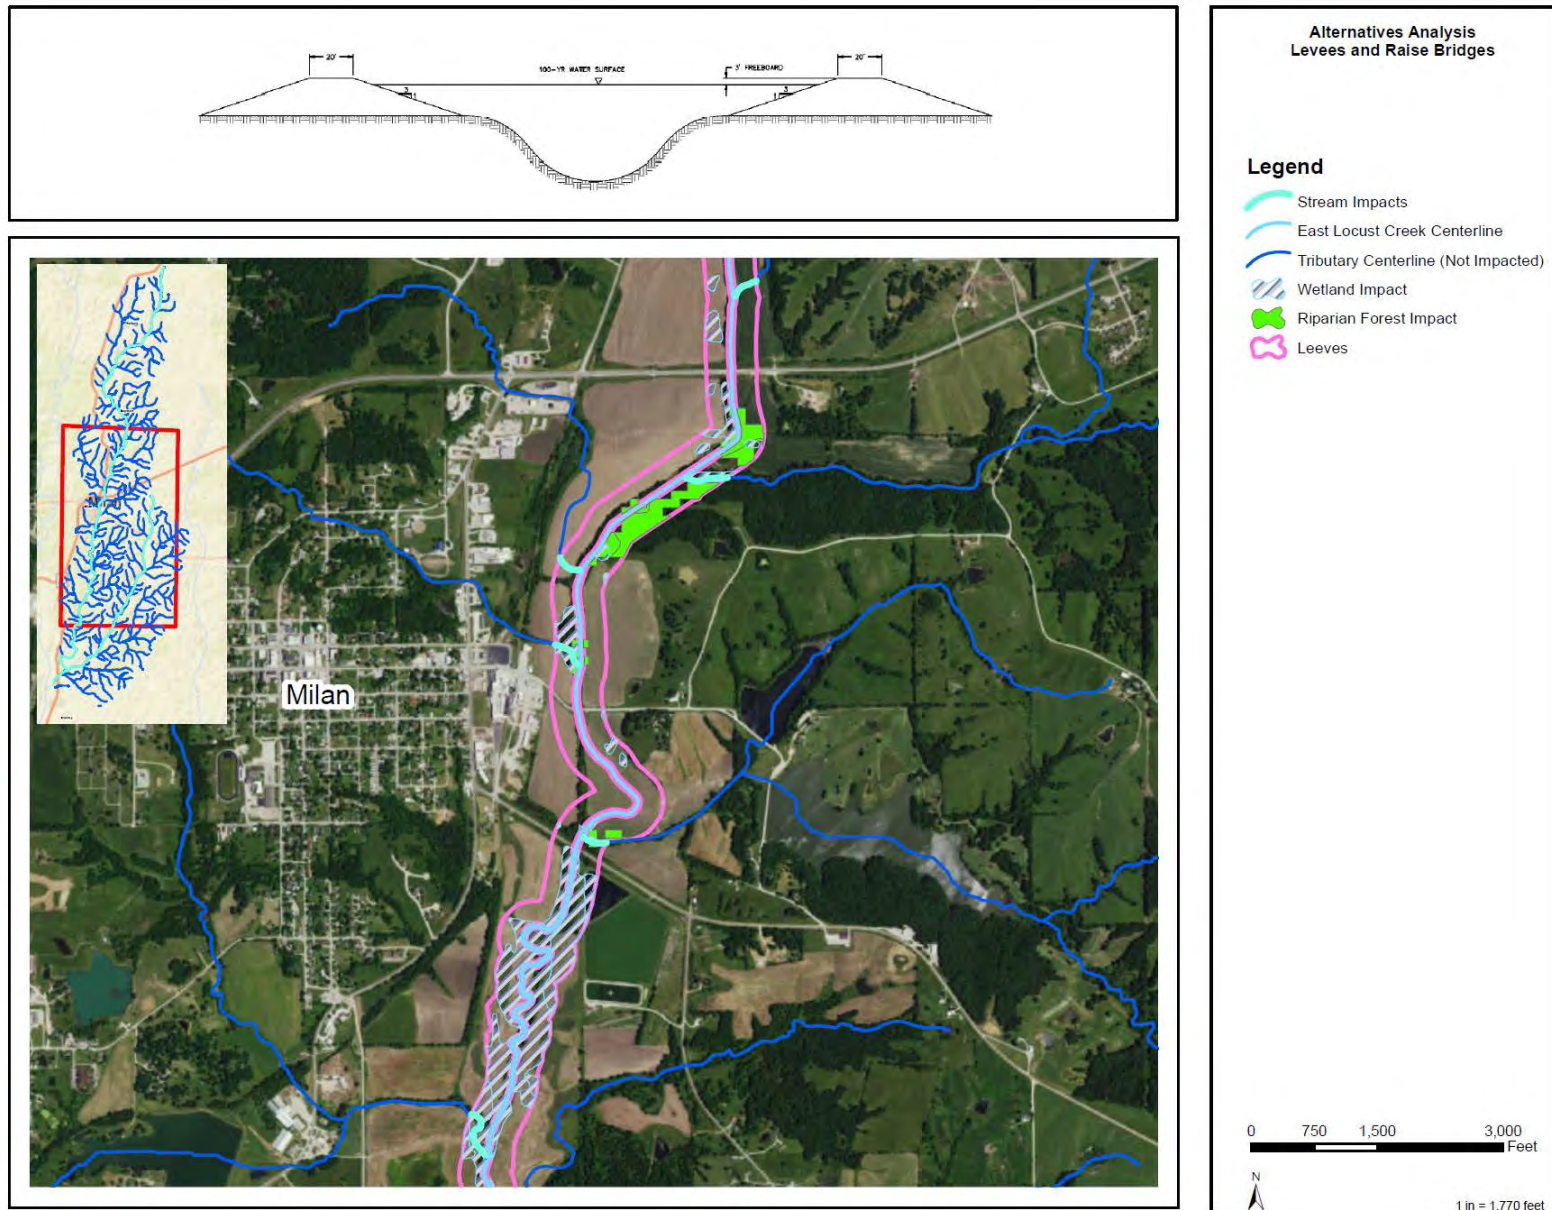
Construct Levees and Raise Bridges Conceptual Plan.
